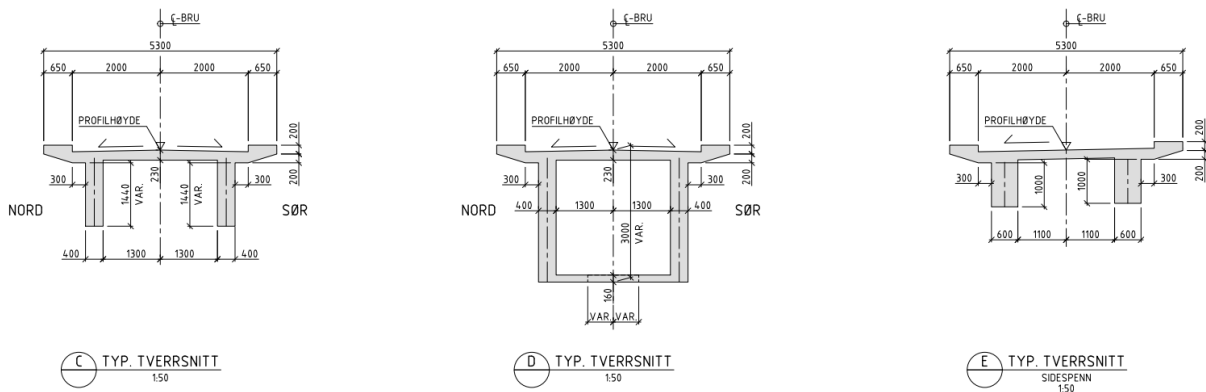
Top deck cross section profiles of bridge spans 1-7 all dimensions in mm [15, 16, 19].
